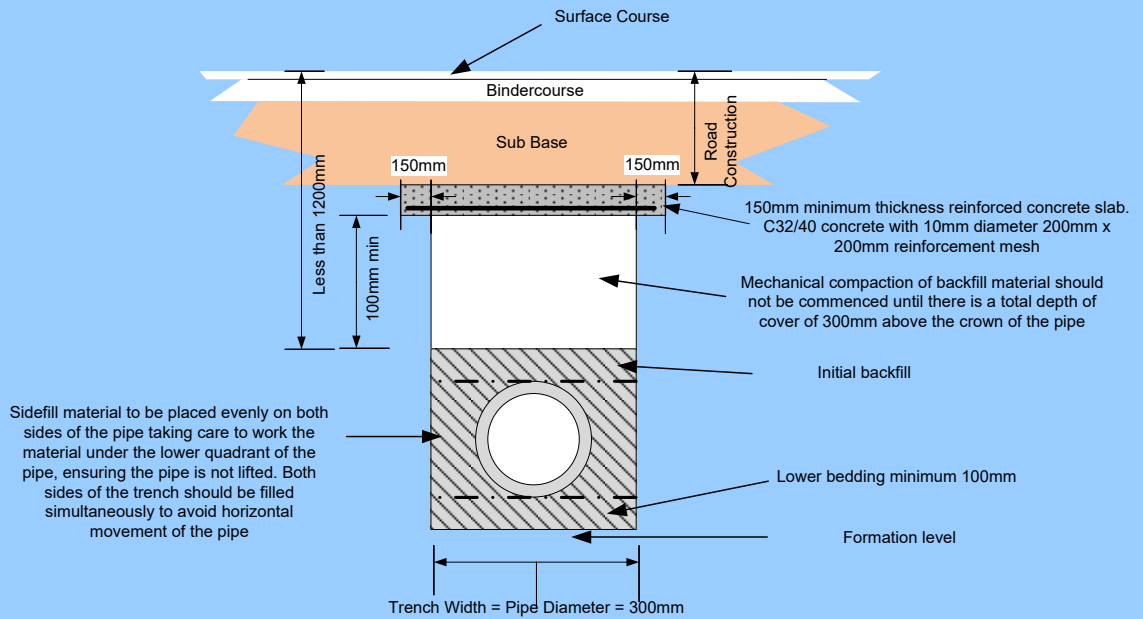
/13 – CONCRETE SLAB PIPE PROTECTION
